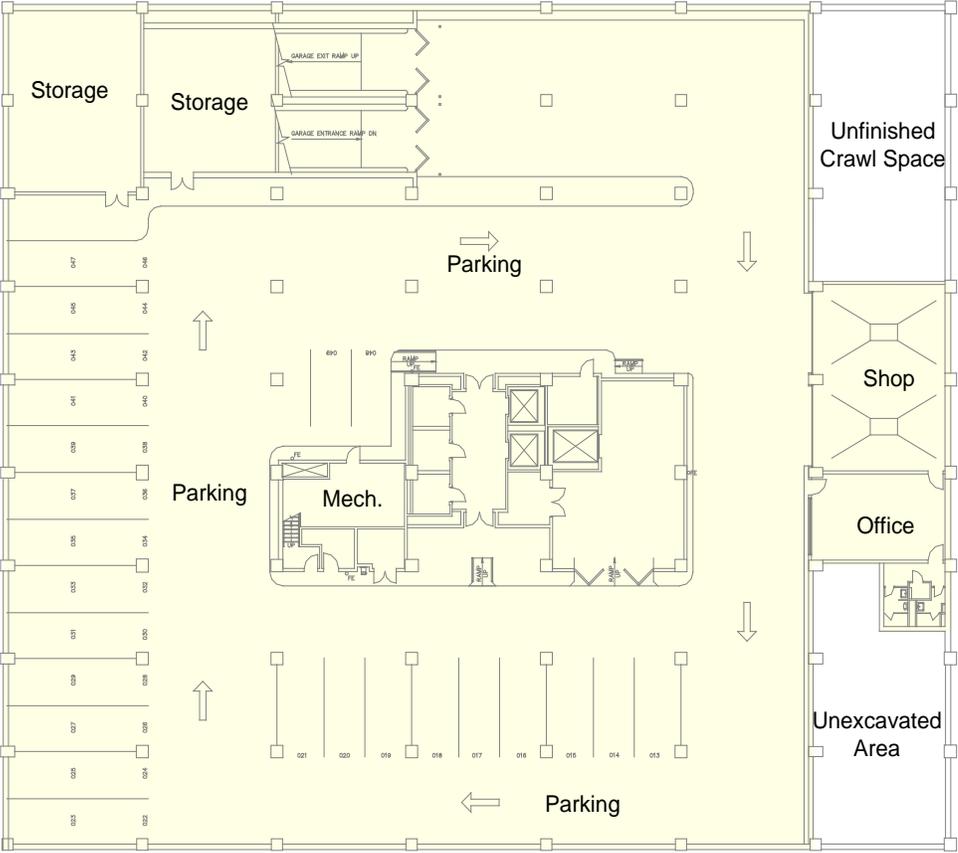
The floor plan layout depicts a basement with unfinished crawl space and unexcavated space, which are excluded from the Gross Area. The coloring depicts the Gross Area of this floor plan.
